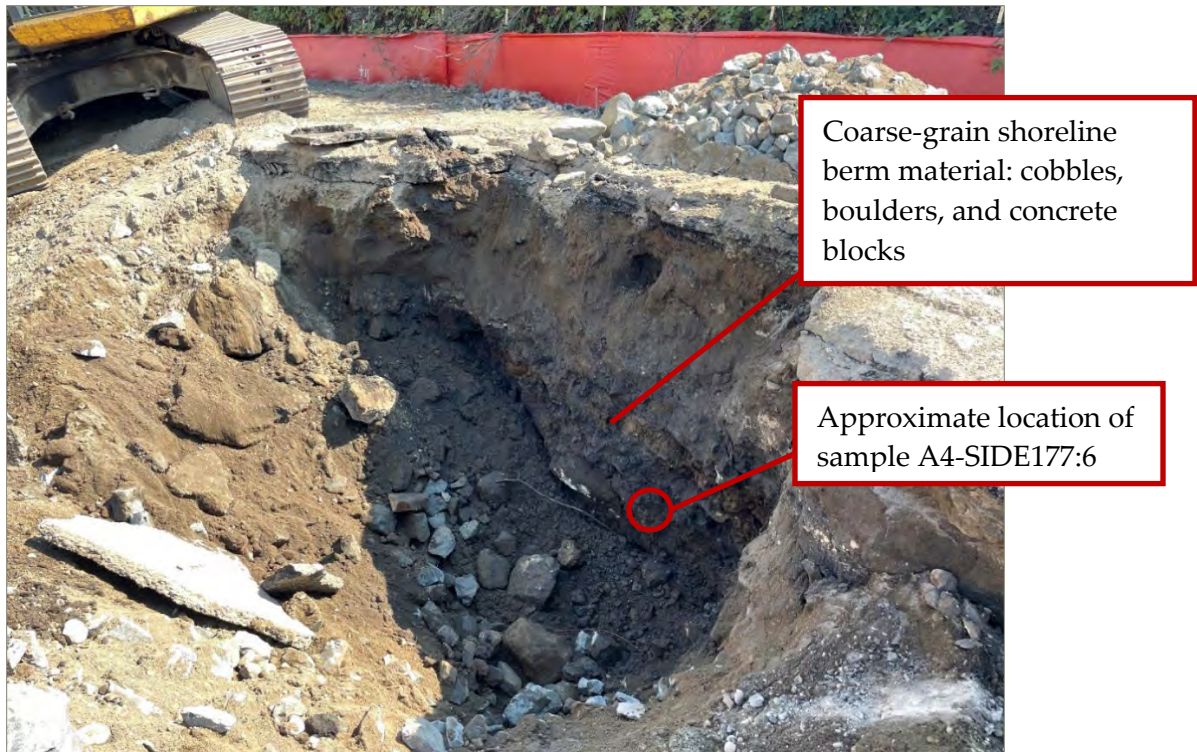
Excavation Activities at Sample A4-SIDE177:6. View direction is south. Photo taken on August 31, 2022.
